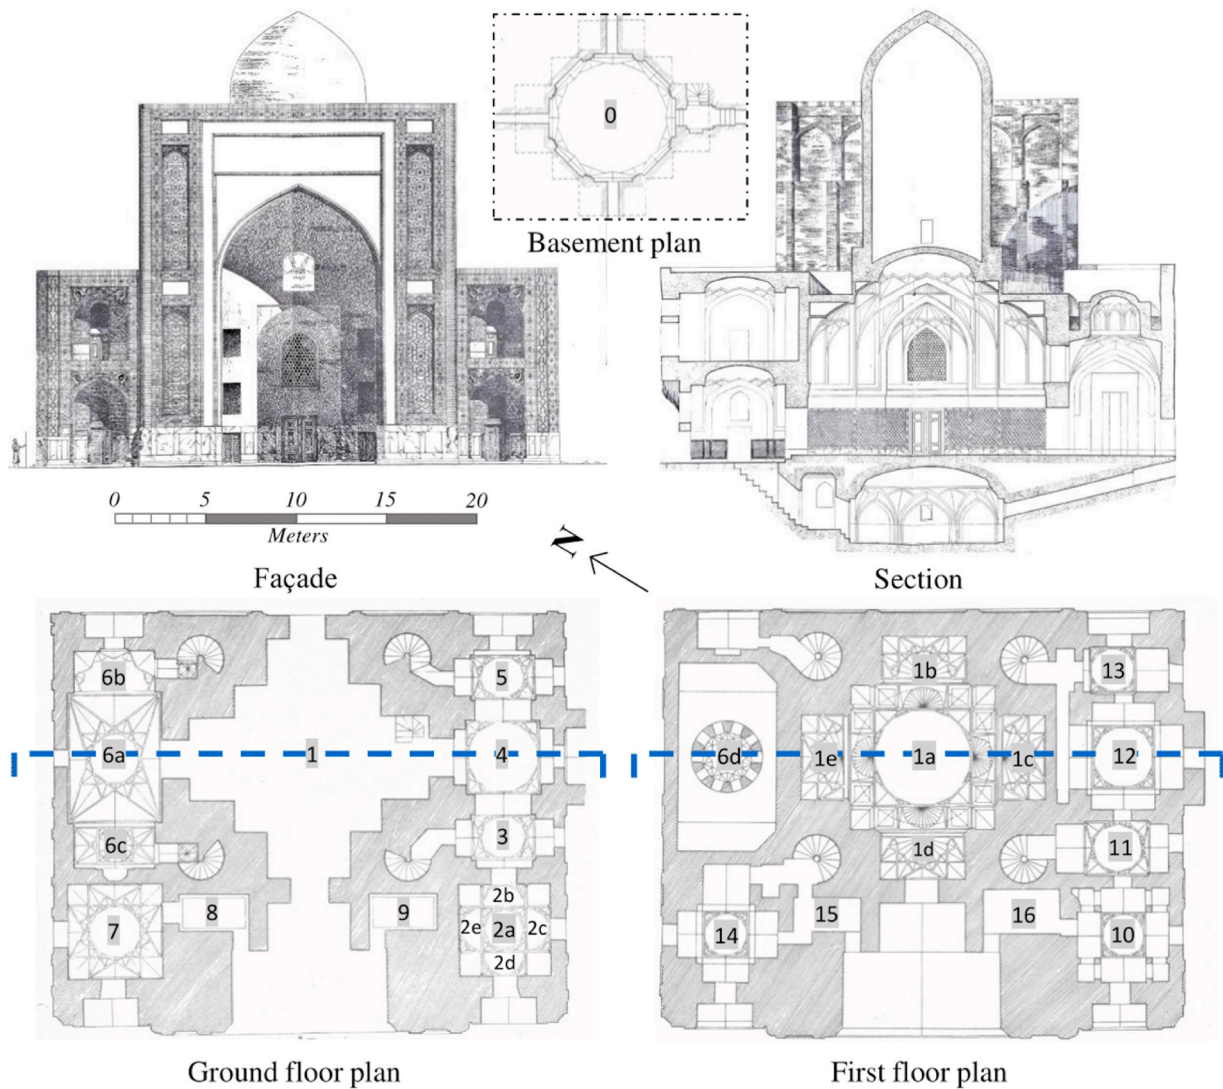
Restitution project of the Ishrat-Khana; plan, section, and façade (formatted according to Pugachenkova).
